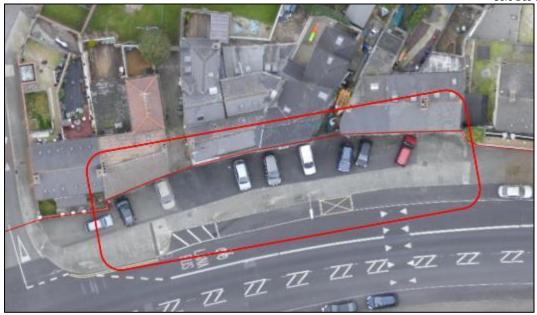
Existing aerial view at 69-79 Emmet Road
